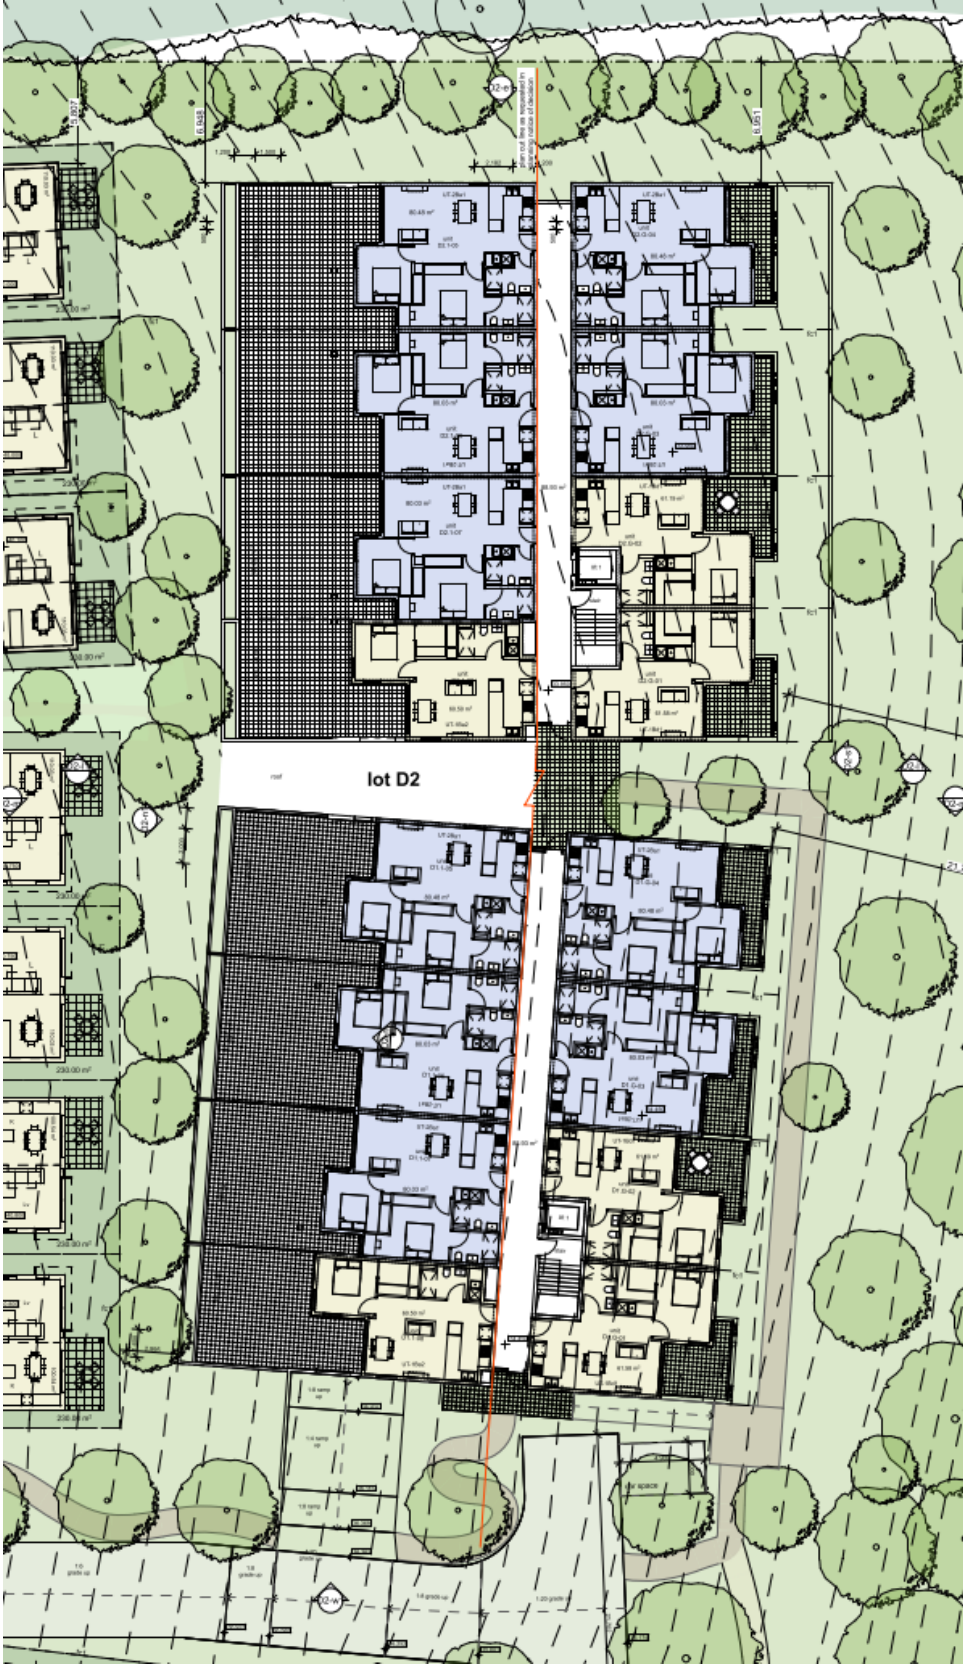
Lot D1/D2 Apartment Building First Floor Plan
